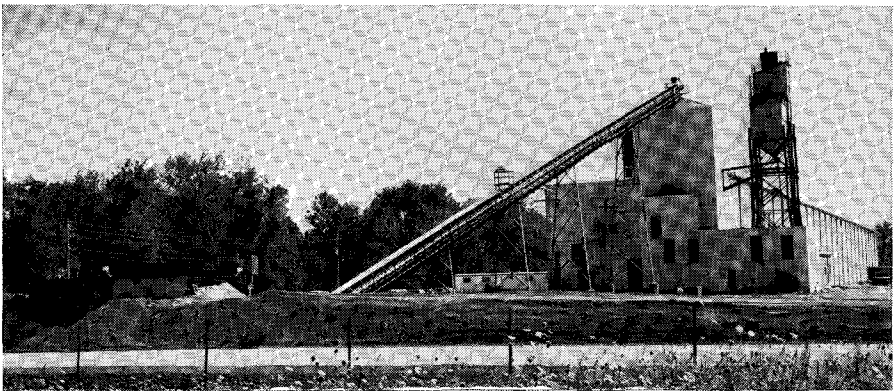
Exterior view of precast concrete plant for manufacturing hollow-core slabs.
